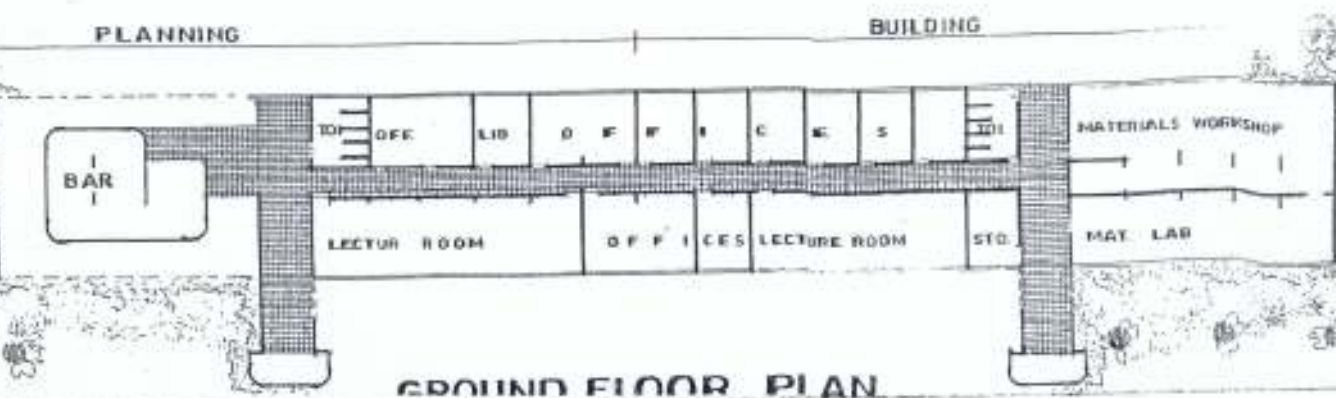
Ground Floor Plan URP and Building Departments
